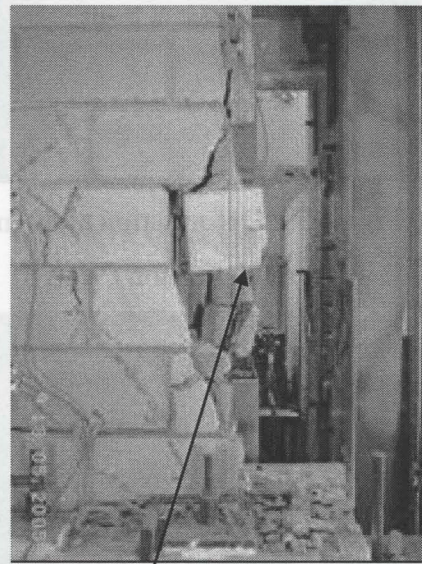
57: Deterioration at the West toe at 72 mm top deflection (Wall 5)
